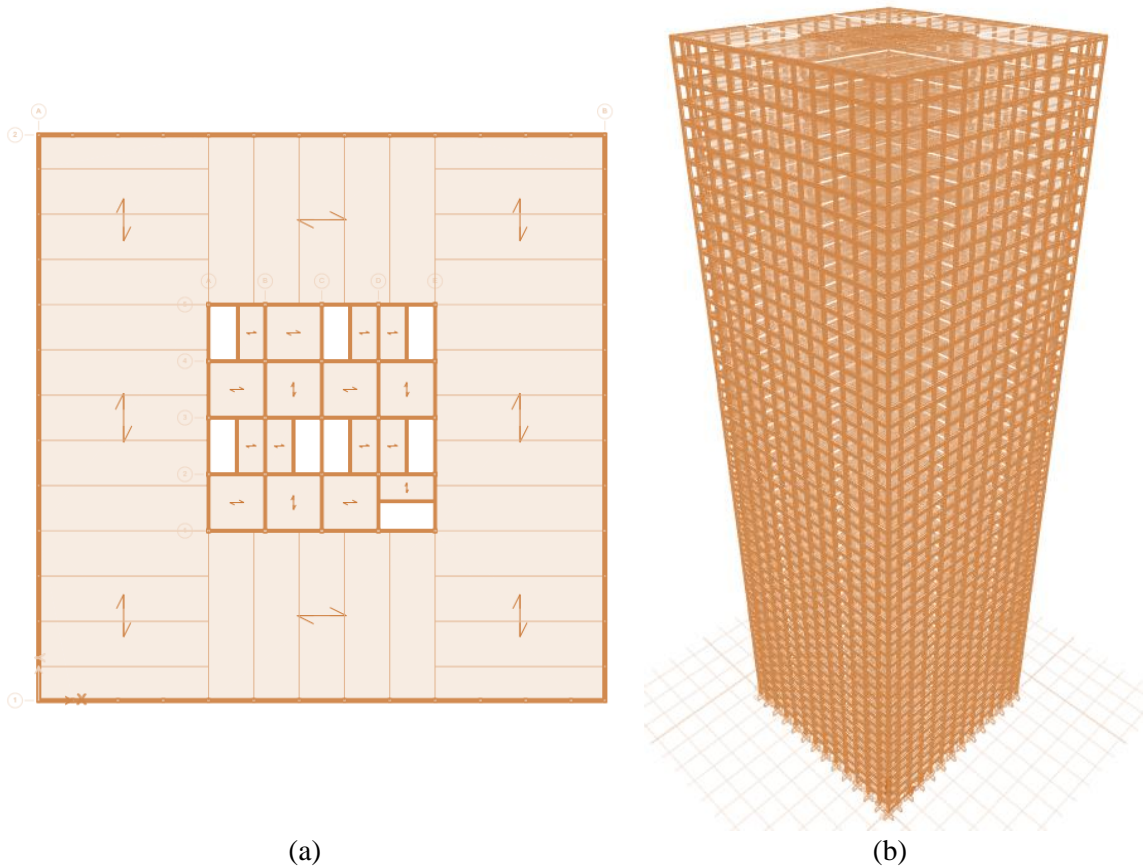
(a) Plan, and (b) 3D view of the 50-story building structure.
